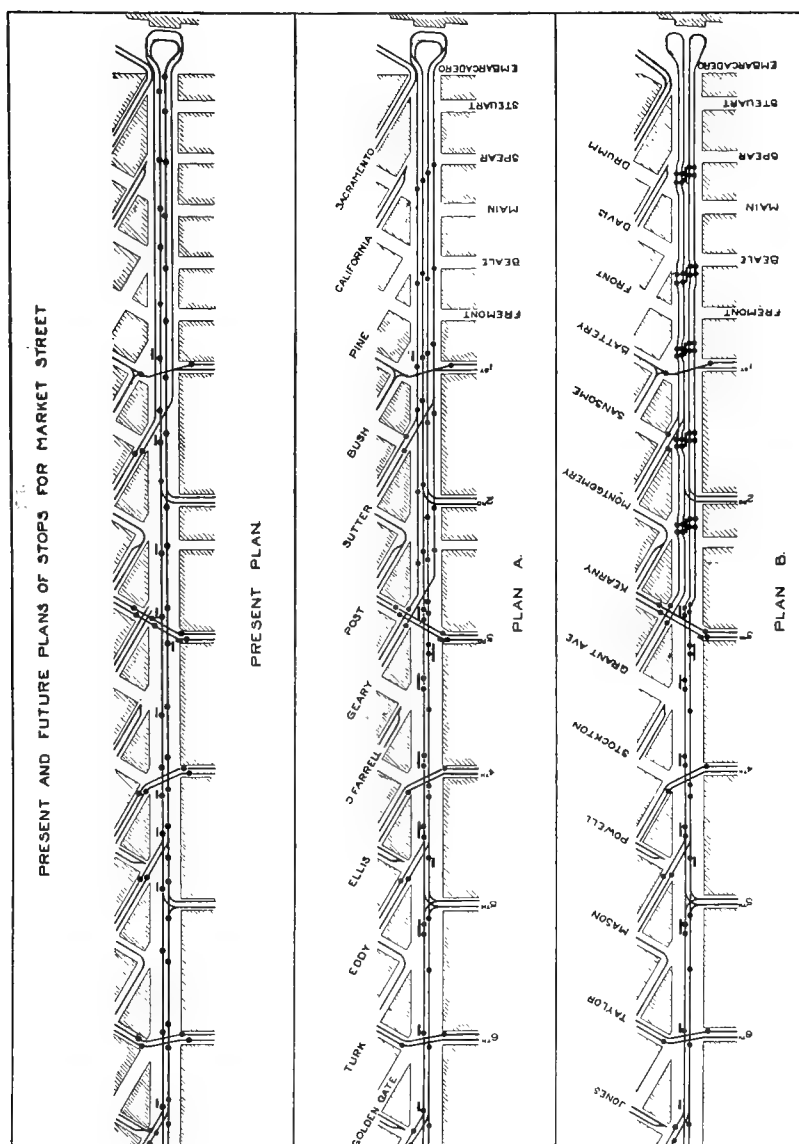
KEY SHEET FOR FOUR-TRACK PLANS.
